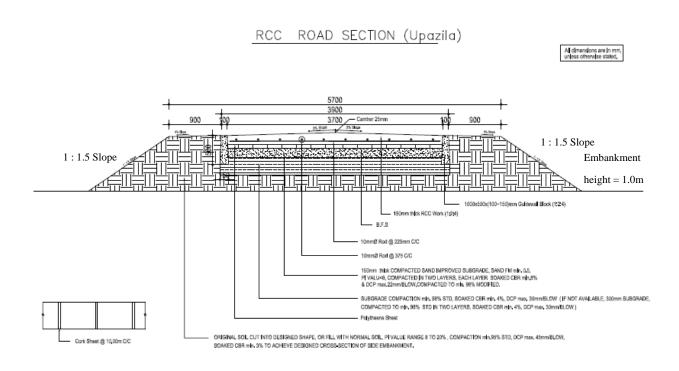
RCC Road Section (Submerged) (Upazila Road)
